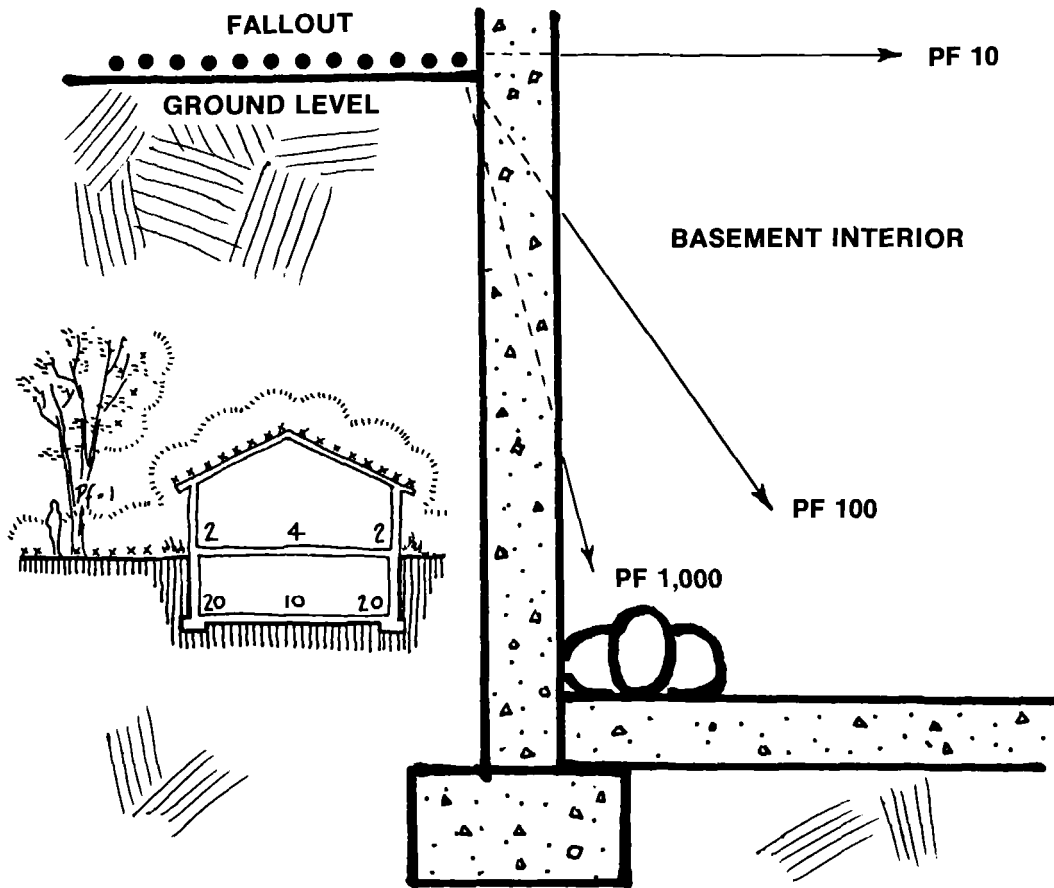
Geometric Shielding in a Basement. The PF provided by a concrete foundation wall increases greatly as the basement floor is approached. Radiation must pass through several feet of earth and concrete to penetrate the wall at such a steep angle. The insert shows
